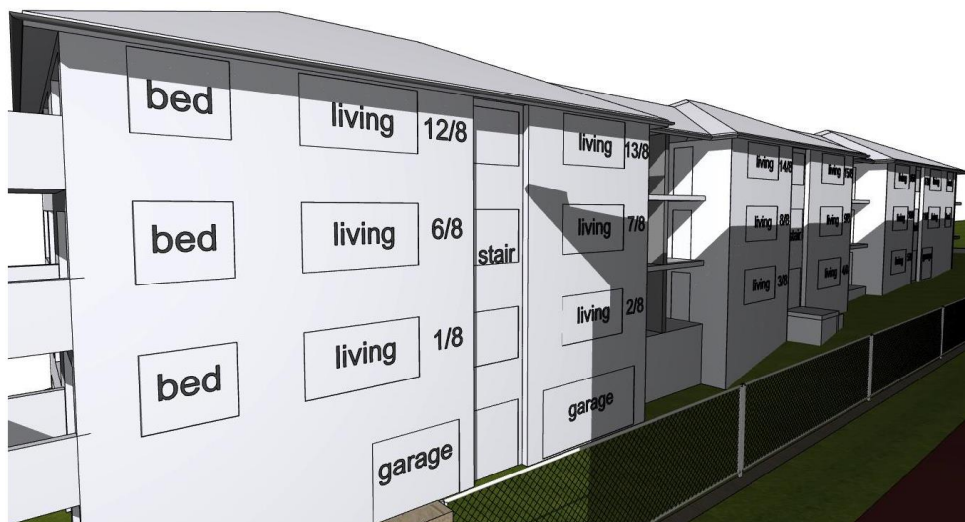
3D Elevational (11.00am, mid-winter) shadow diagram of the adjoining 8 Essex Street building.
